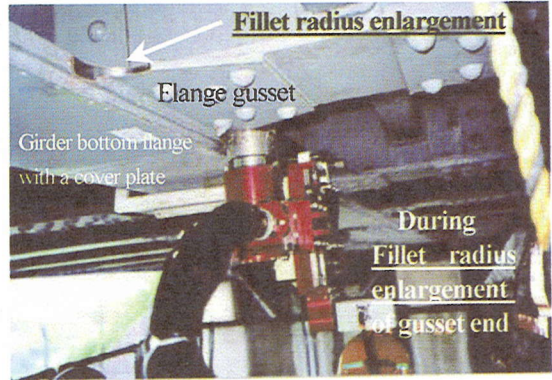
Example of "Repair F" performed by fillet cutting at the end of flange gusset in Shinkansen bridge.
